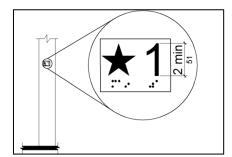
Floor Markings on the Jambs of Elevator Hoistway Entrances
